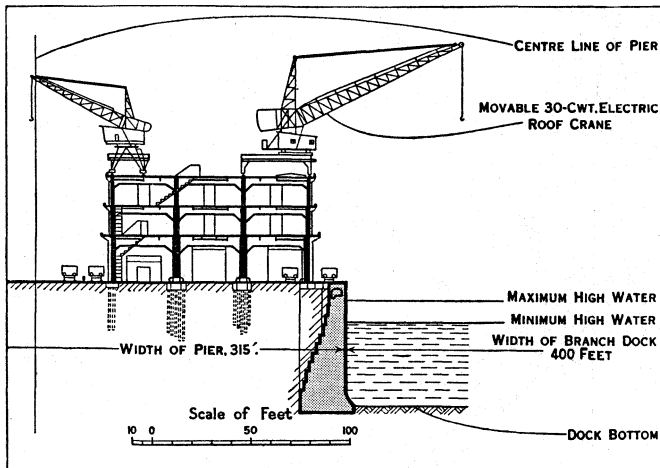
GLADSTONE DOCK, LIVERPOOL. HALF SECTION THROUGH THE BRANCH DOCK AND QUAY SHED SHOWING MOVABLE ROOF CRANES
